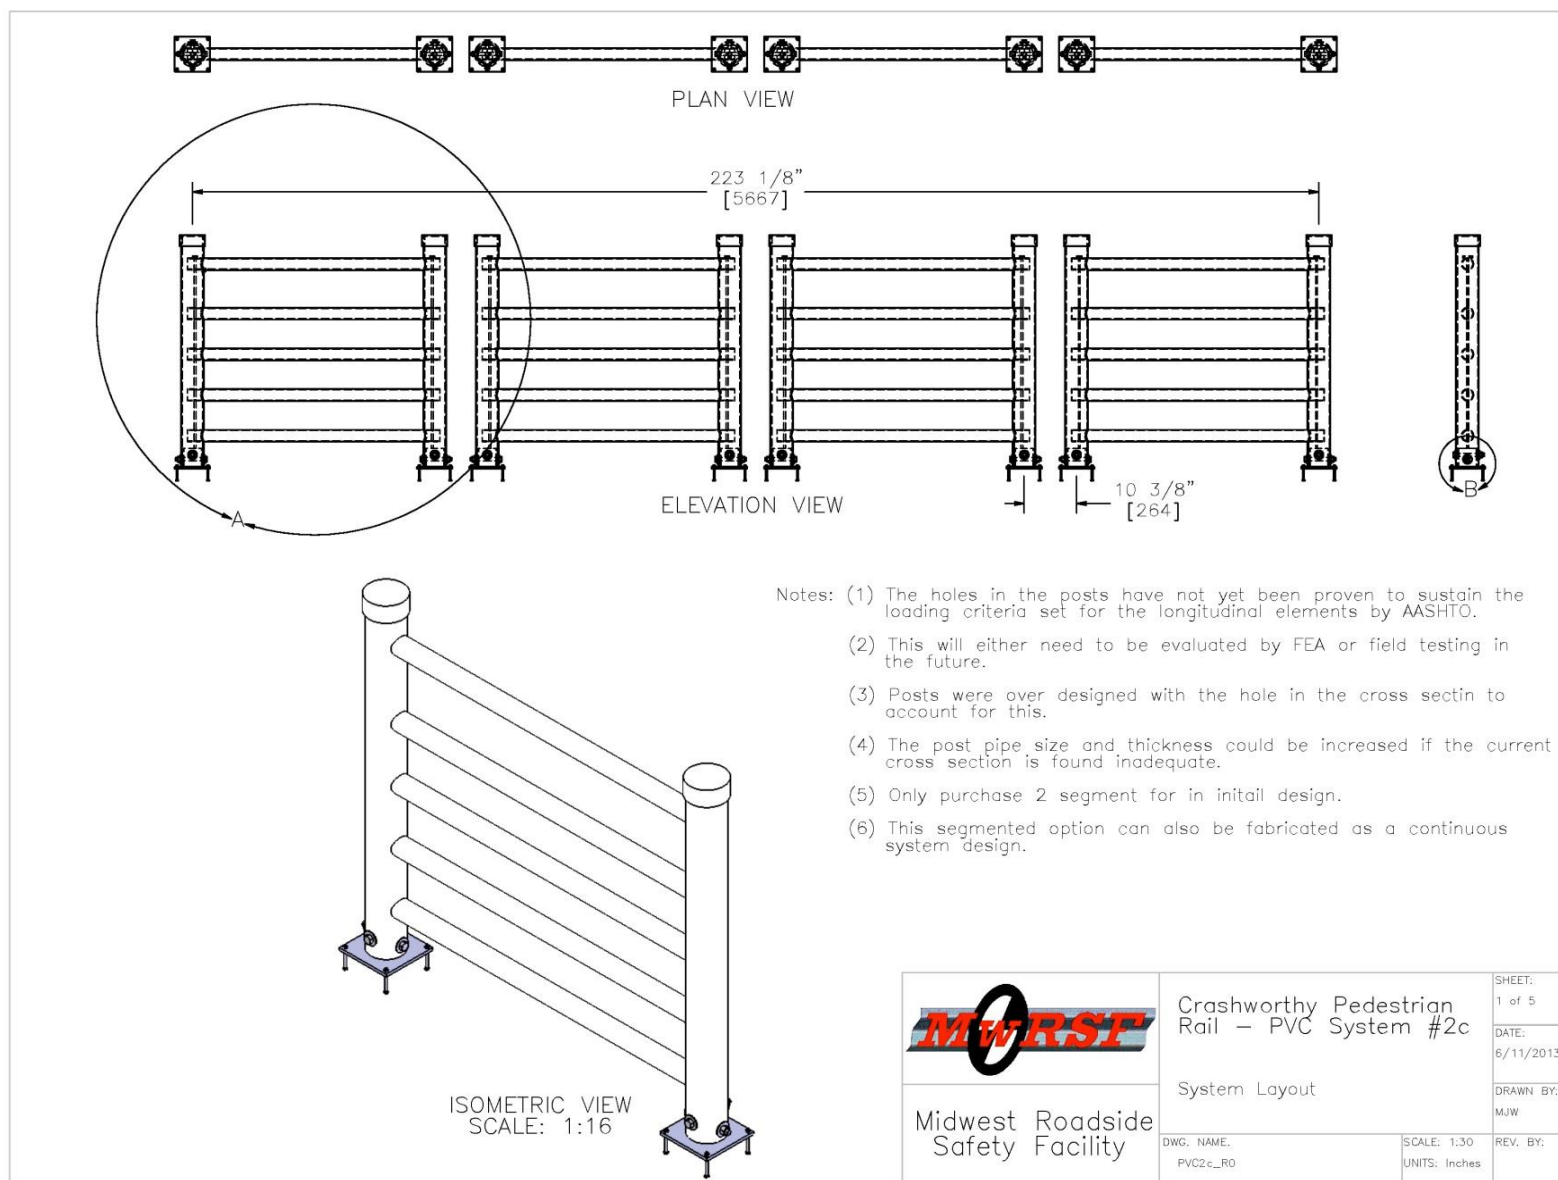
Modular PVC Rail, Design Concept PVC2-c (Sheet 1 of 5)
